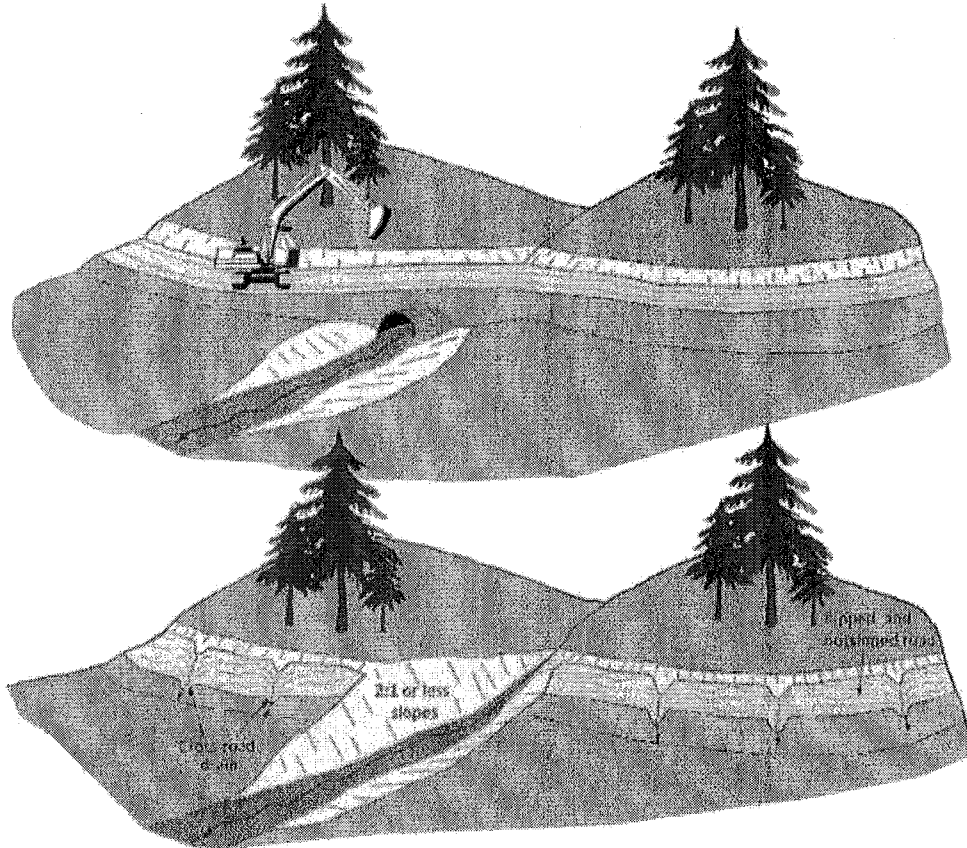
On roads that are to be closed (decommissioned), all stream crossing culverts and fills should be removed. Stream crossing excavations are best performed using an excavator. The original channel should be excavated and exhumed down to the former streambed, with a channel width equal or greater than the natural channel above and below the crossing. Side slopes should be laid back to a stable angle, typically a 2:1 (50%) gradient, or less. Spoil can be endhailed off-site or stored on the road bench adjacent the crossing, provided it is placed and stabilized where it will not erode or fall and enter the stream.
